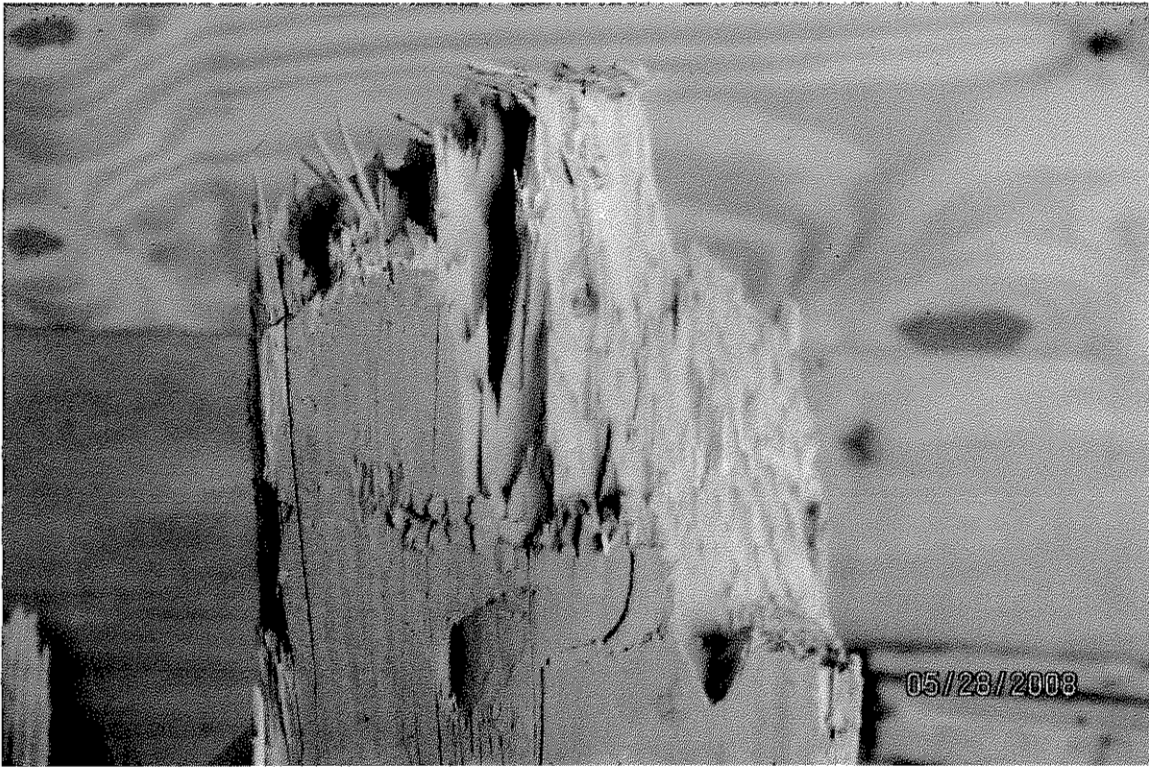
Brash failure with partial tension finger in 3x4 stored on 40th floor.
